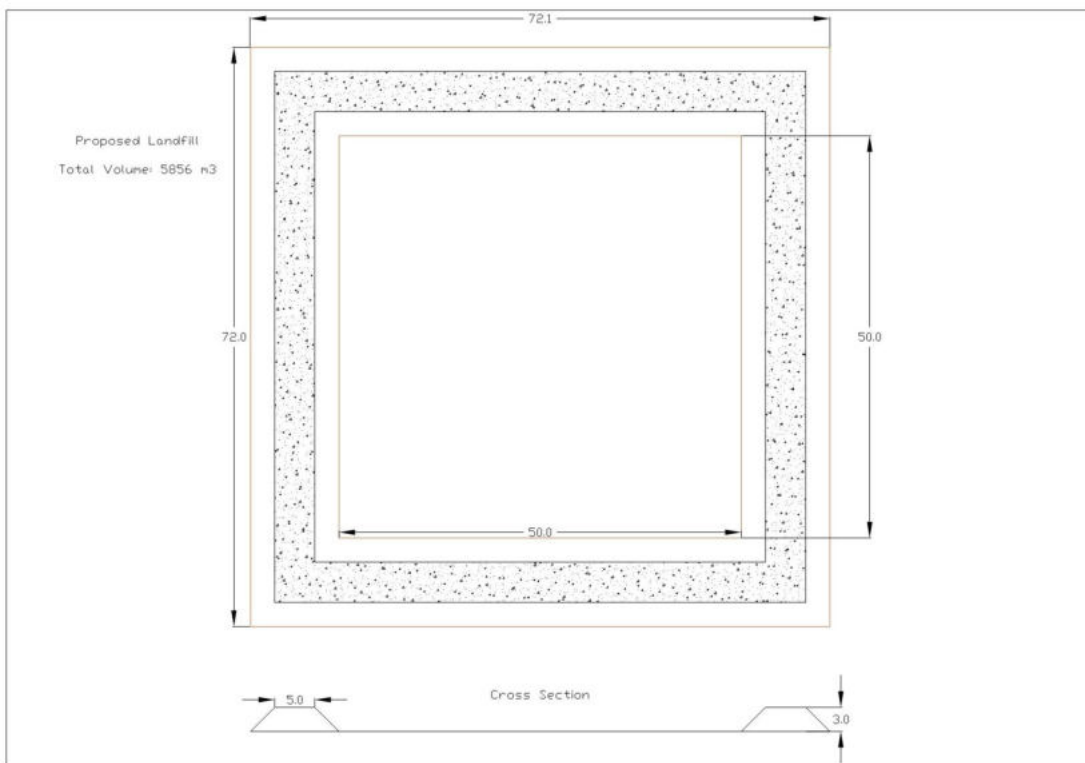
DESIGN PLAN OF THE PROPOSED WASTE DISPOSAL FACILITY
